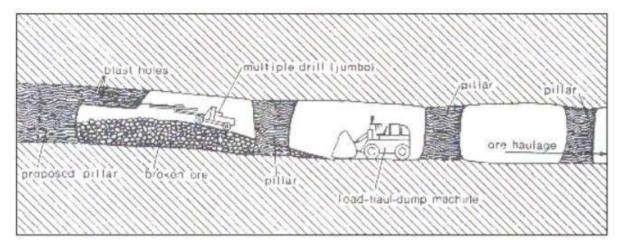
Cross section of typical bord-and-pillar layout (Source: Scoble, 1993)
